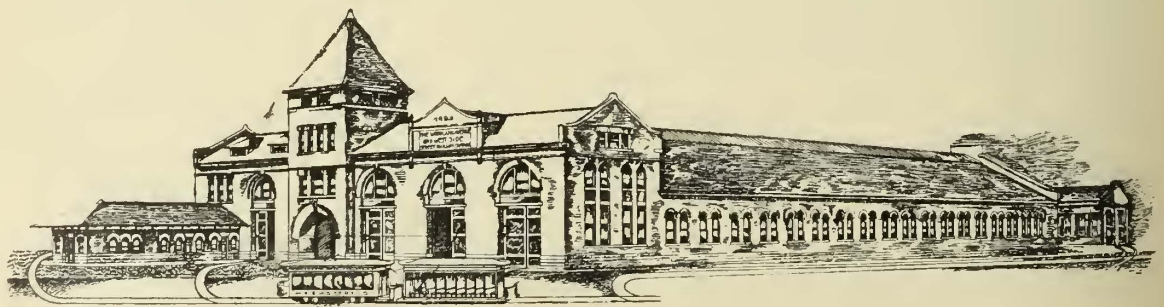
NEW CAR HOUSE—WOODLAND AVENUE & WEST SIDE RAILWAY.
